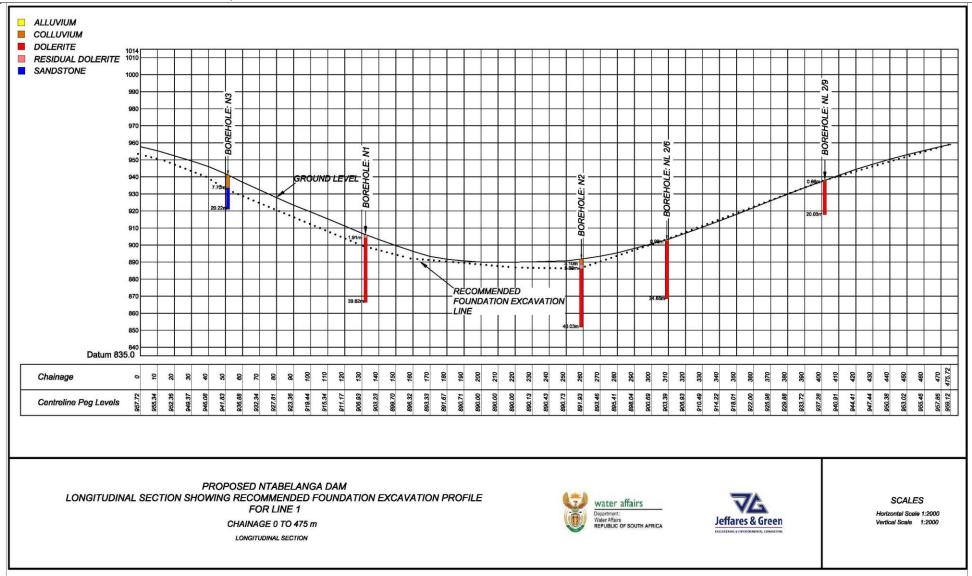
LS - Recommended Foundation Excavation Profile for Line 1
